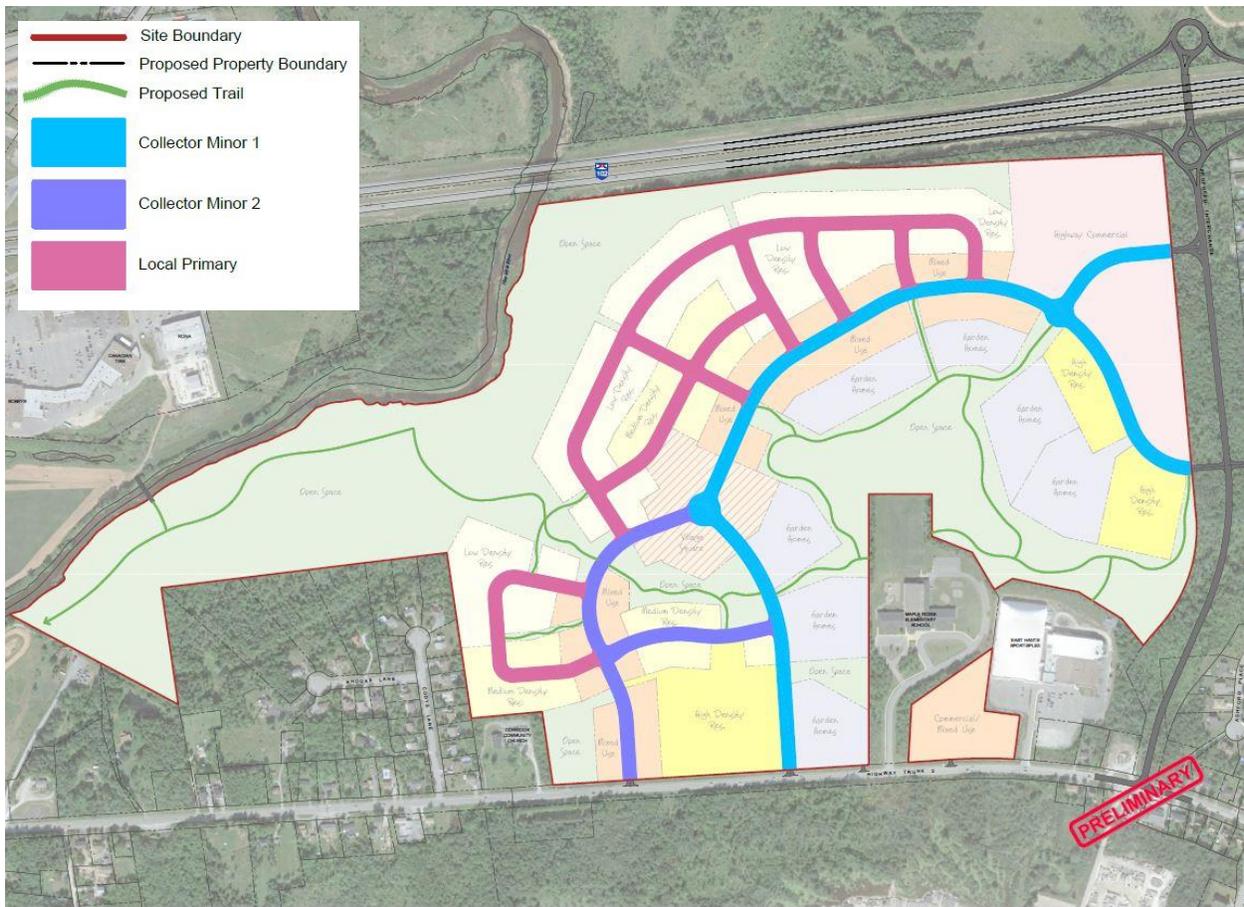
Proposed street network plan for the Lantz Lands. See Appendix A for larger plan image.
